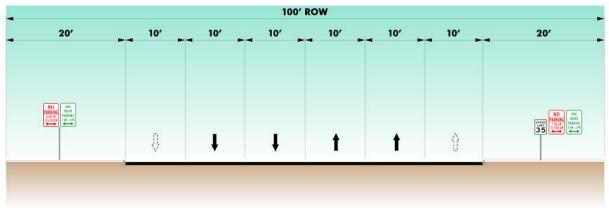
Enhanced Streetcar Truman Road Alignment Typical Section - Van Brunt from 20th-26th Streets
